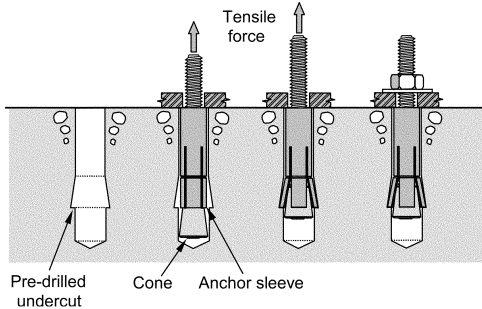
(a)—Type 1 undercut anchor. Load-controlled anchor installed by tensioning anchor causing sleeve to expand into predrilled undercut.
